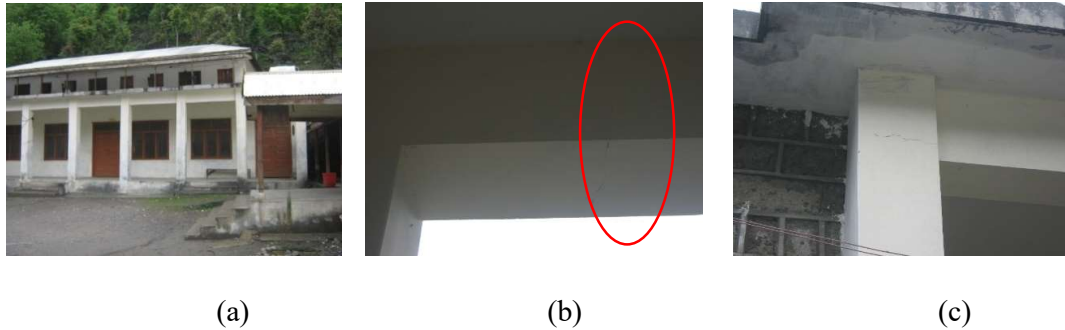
Photographs of a school having cracked structural members: a) Isometric view of school in Neelam District; b) Cracked beam; c) cracked column
